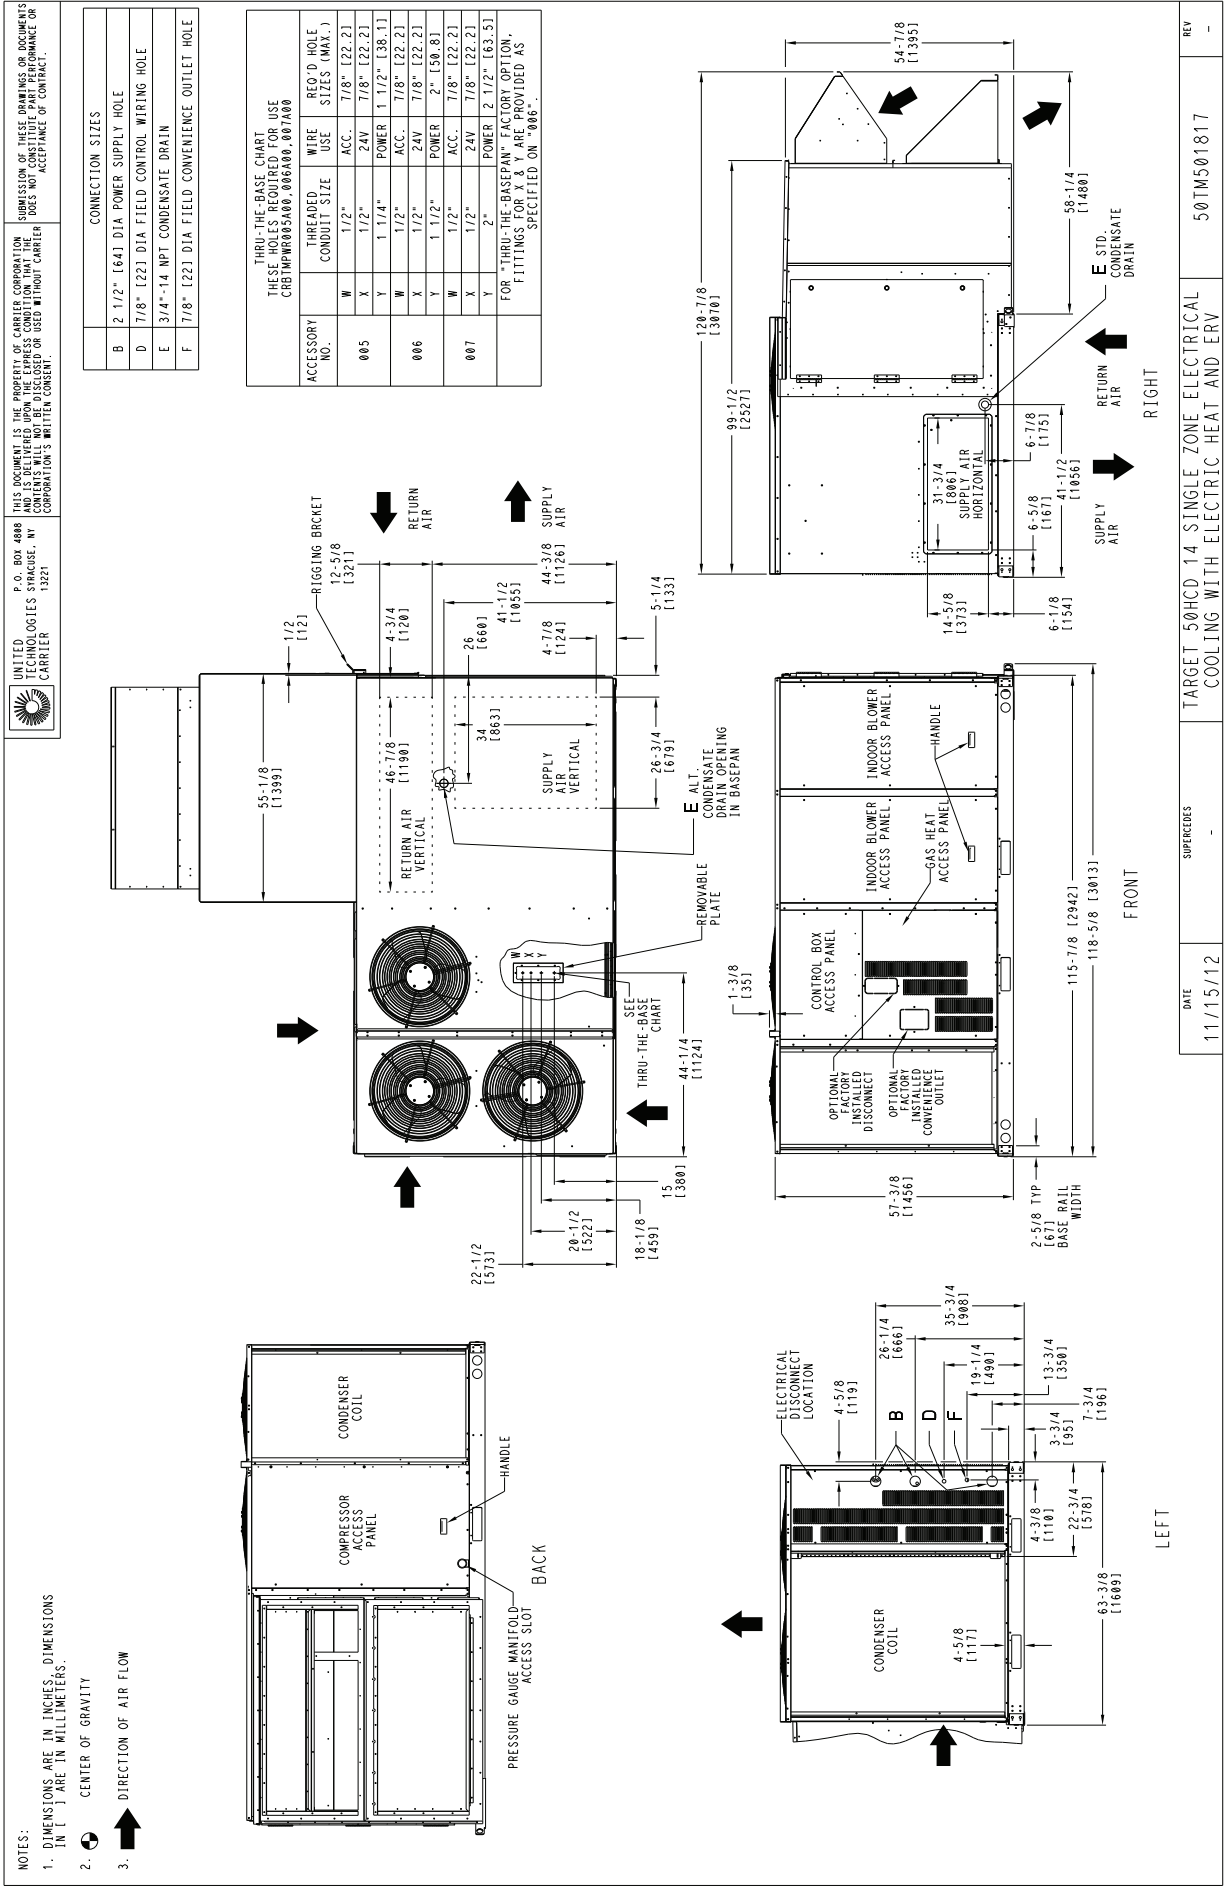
50HC-14 Single Zone Electric Cooling with Electric Heat and ERV (Sheet 1 of 2)
